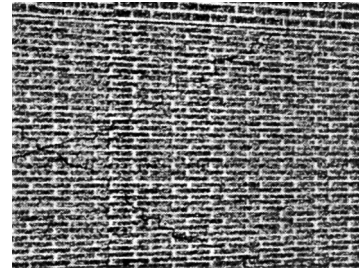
X-Shaped Cracking Along Exterior Wall
